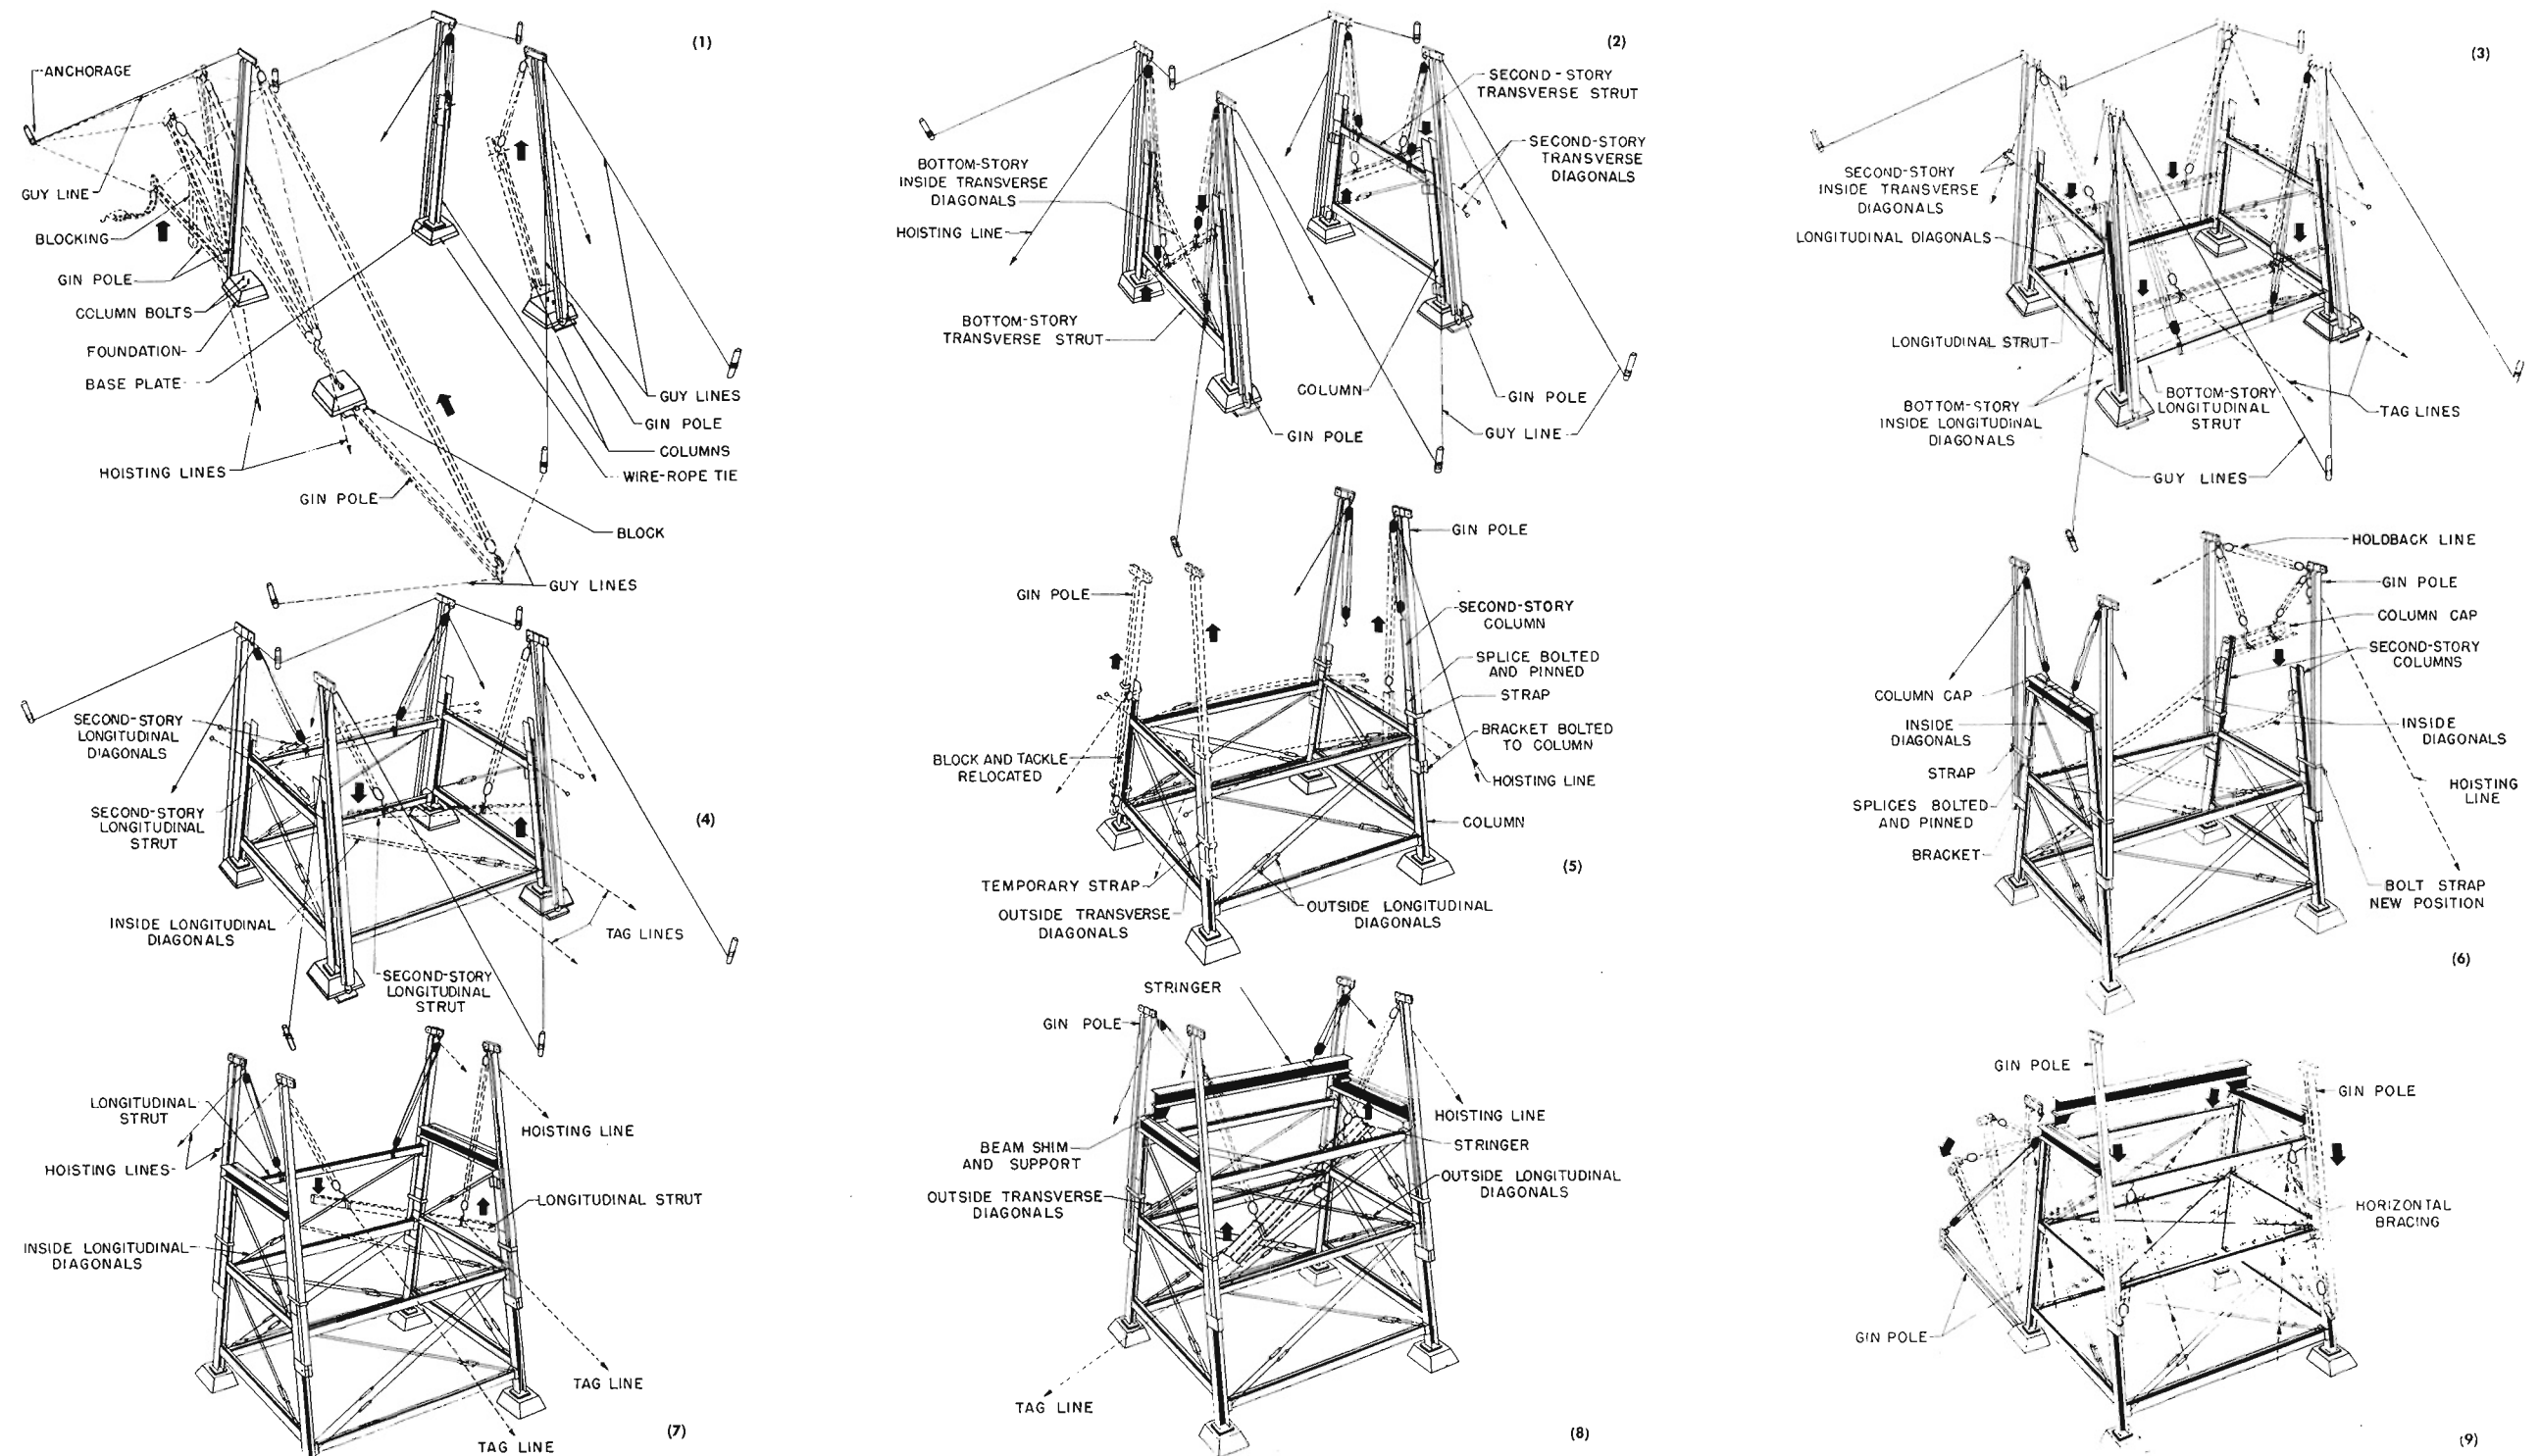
Sequence of erecting two-story steel tower with steel gin poles made of bridge sections.
